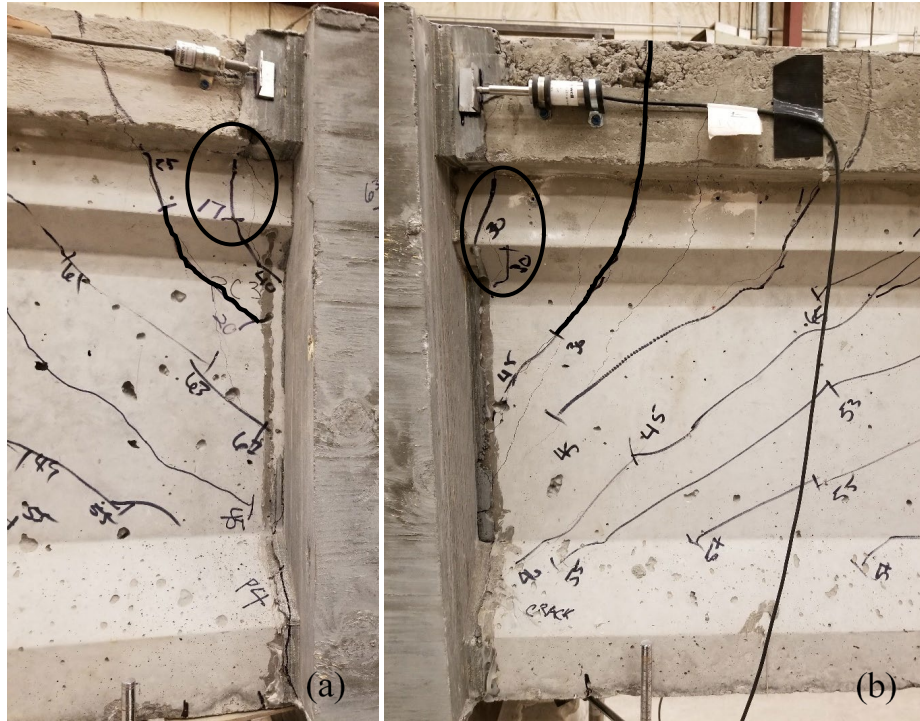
Initial flexural cracking on the RC3-N girder at 17 kips of load and initial flexure-shear cracking on the RC3-N girder at 20 kips of load (a) and initial flexural cracking on the RC3-S girder at 30 kips of load and flexure-shear cracking on the RC3-S girder at 30 kips of load (b). Dark ovals show the initial flexural cracking near the continuity joint and arrows point to the dark lines that indicate the initial flexure-shear cracking.
